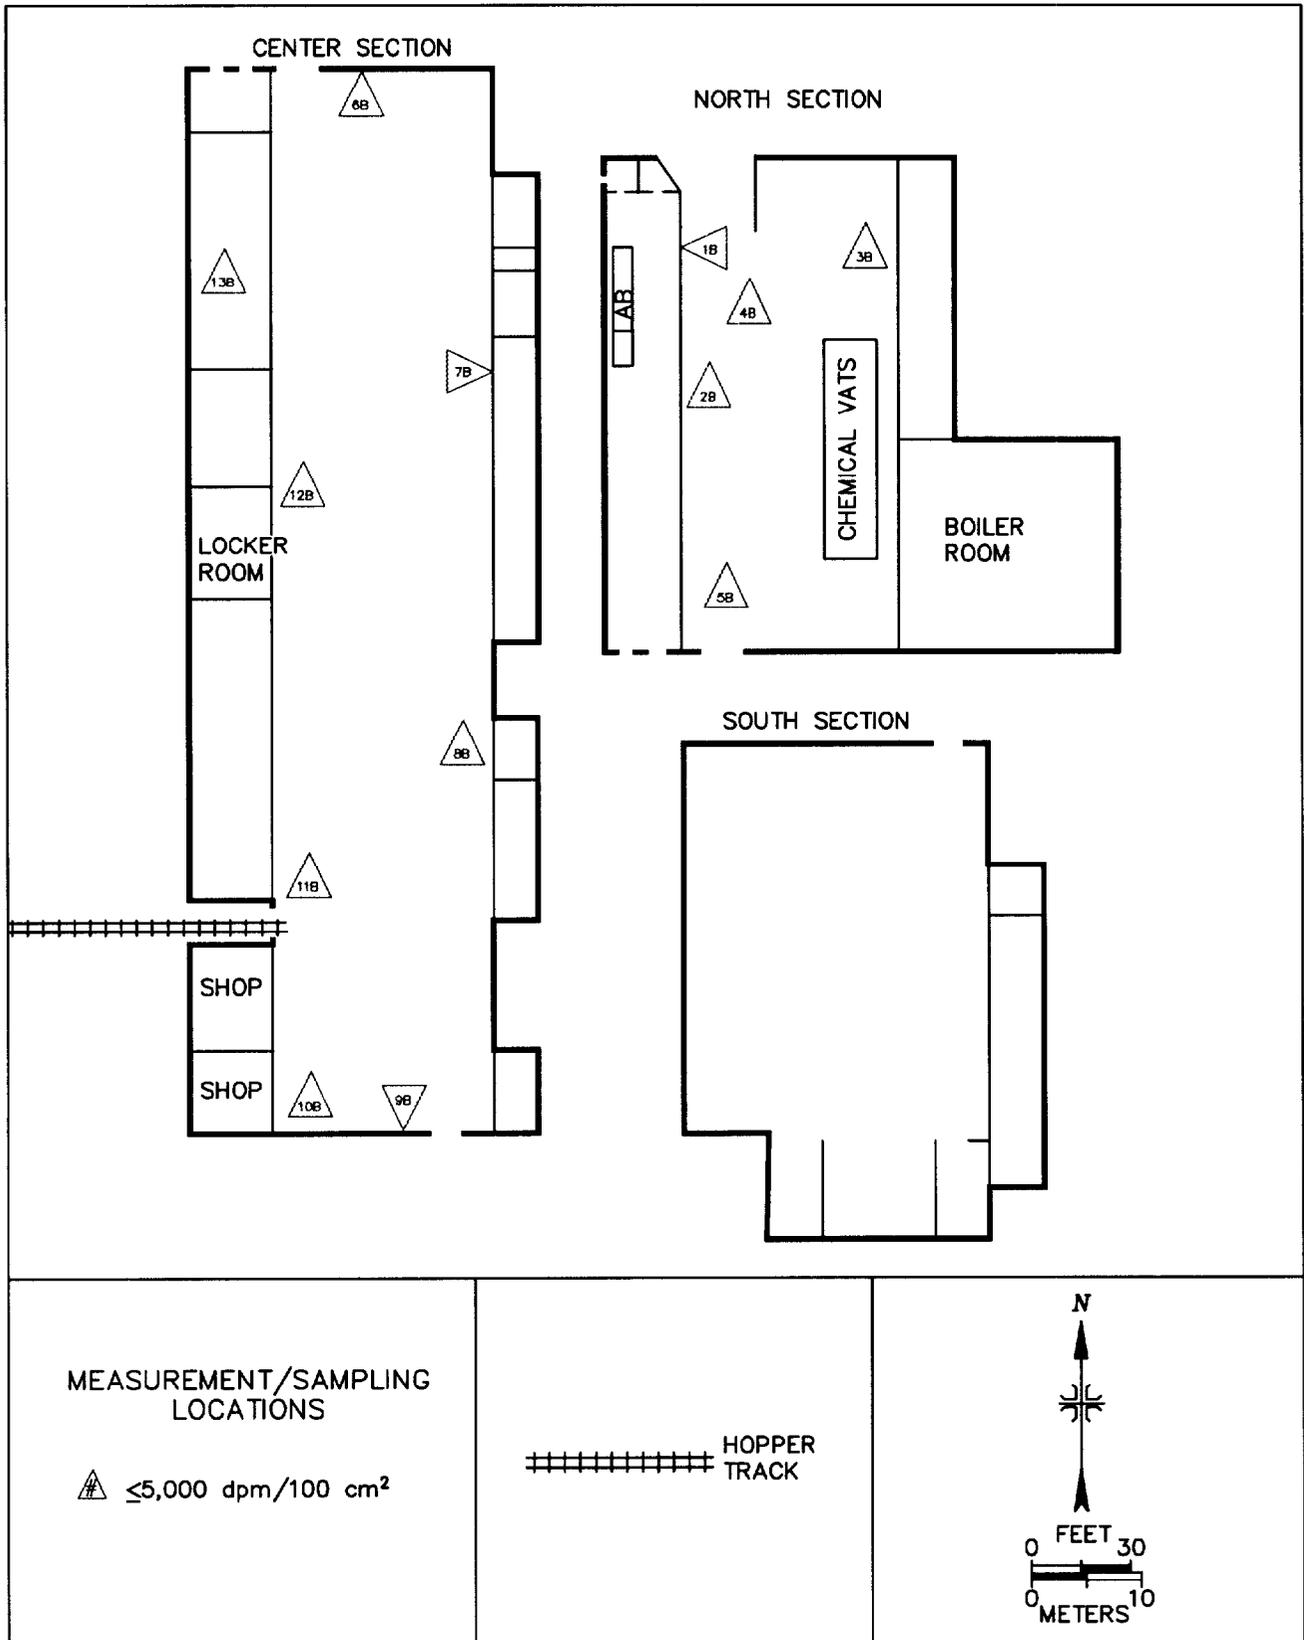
Building 2, Upper Surfaces – Direct Measurement and Sampling Locations
